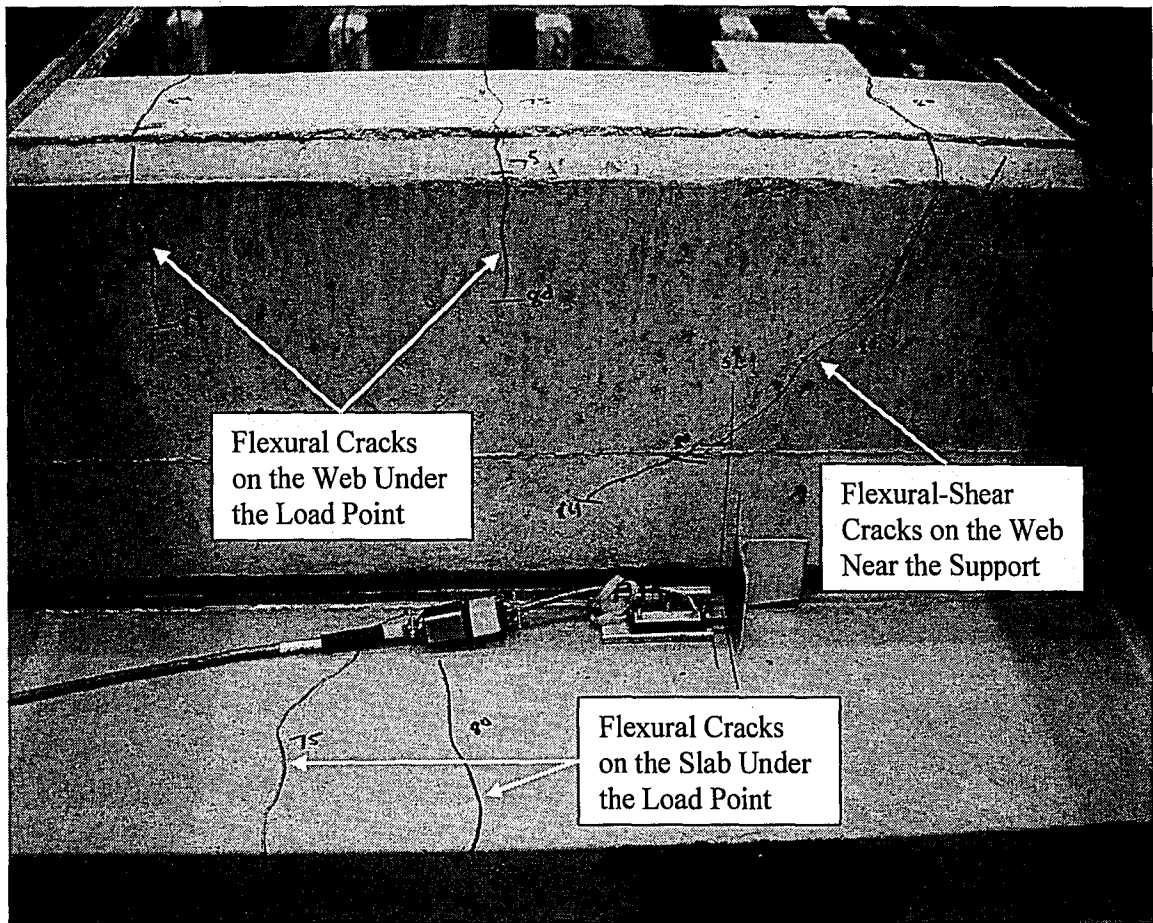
Cracks on West End of Specimen at Failure [Specimen 6R7]
